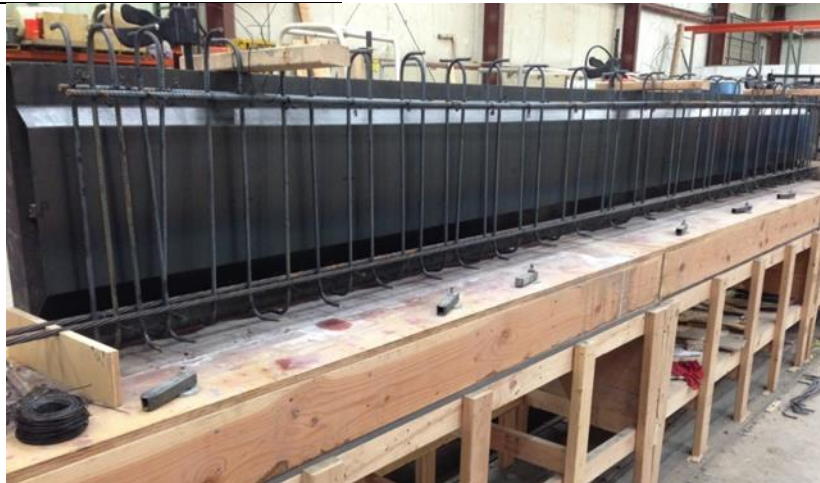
Reinforcing steel and formwork in place prior to casting scale girders
